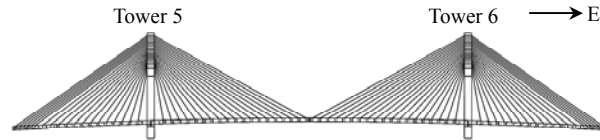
Finite element division (Elevation of Wenhui Bridge)
